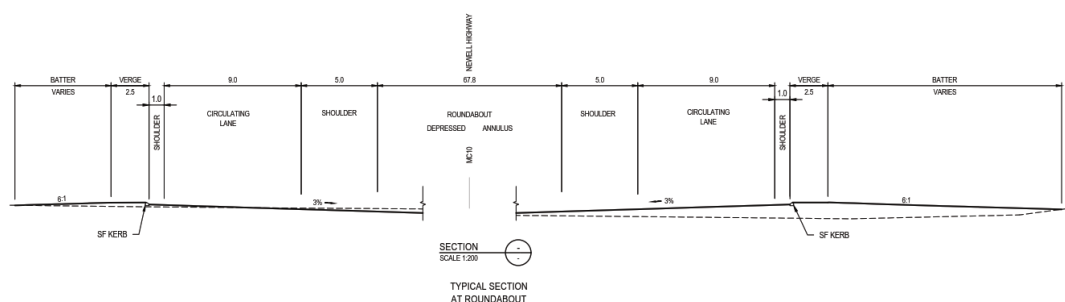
Cross section of the proposed roundabout at Condobolin Road
